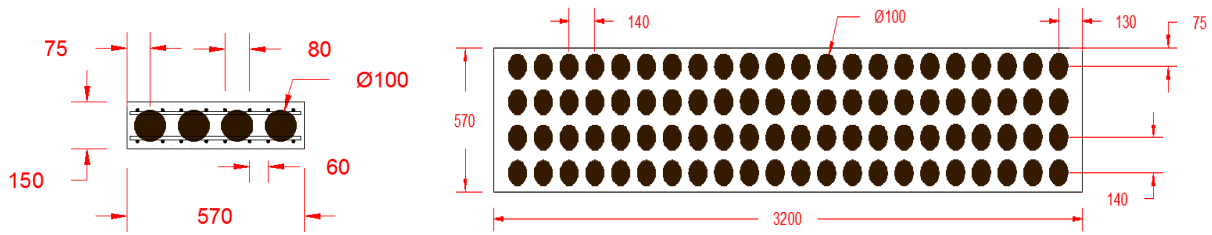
Longitudinal and Transversal Arrangements of Voids in Bubbled Slabs.
